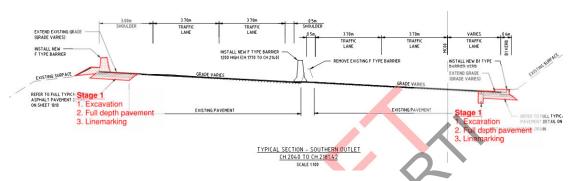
Typical section - Southern Outlet Ch. 2040 to Ch. 2181.42
